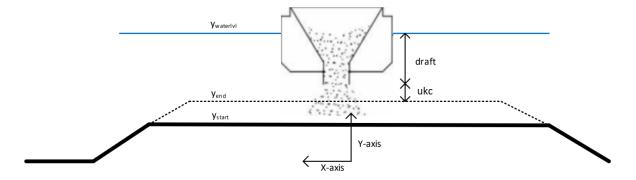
Situation when split barges, side dumpers and fall pipe vessels can install a certain part of the construction
